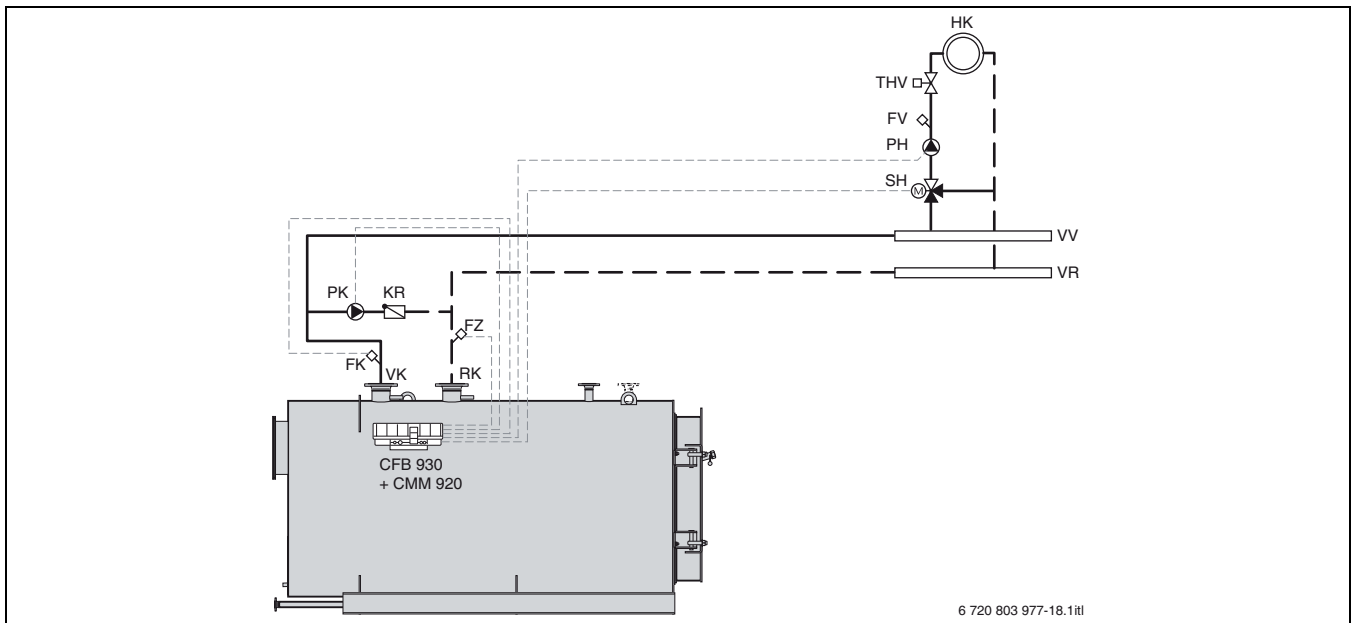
System example for UNIMAT UT-L boiler CFB control unit for boiler and heating circuit control unit (list of abbreviations → page 47)
